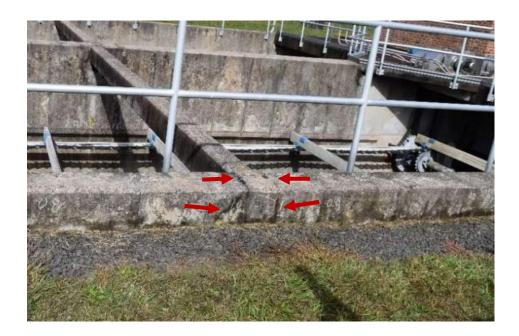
South Wall of Basin No. 2 at East Bracing Strut (Looking North)
